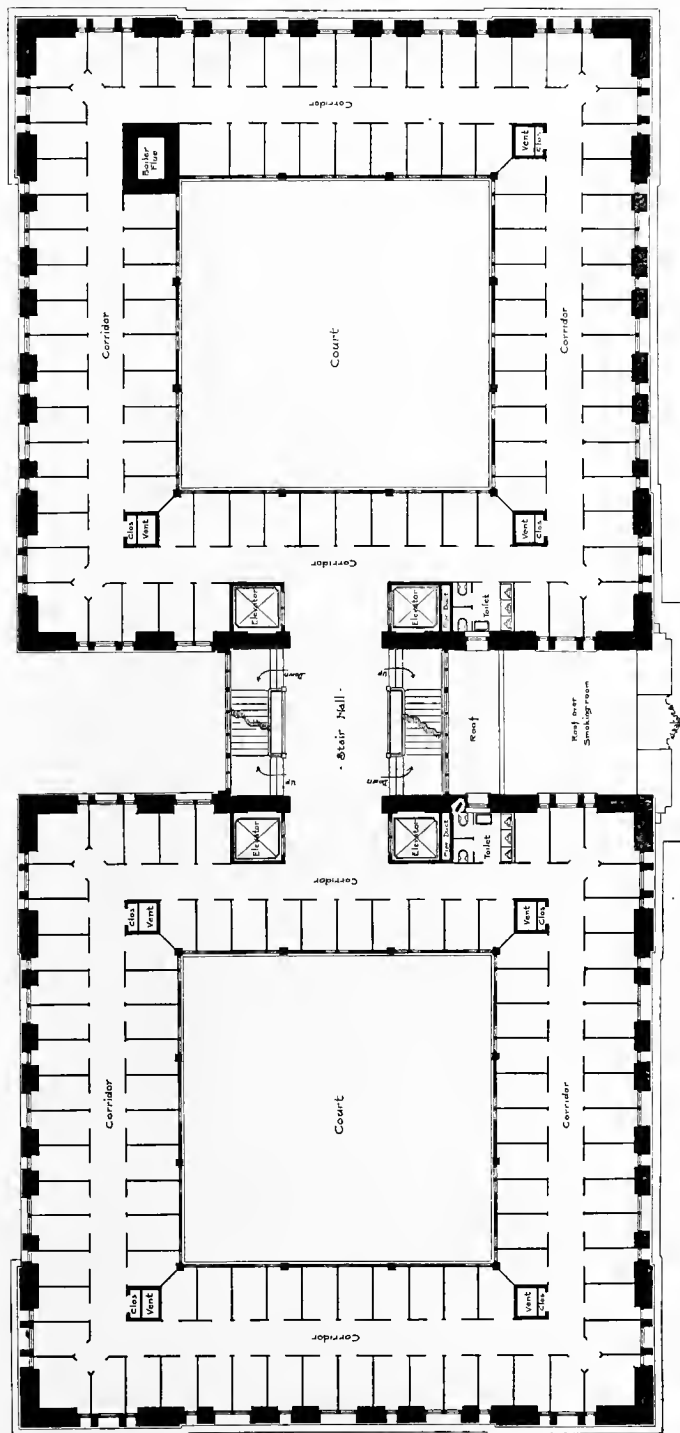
TYPICAL FLOOR PLAN OF MILLS HOUSE NO. 1.
